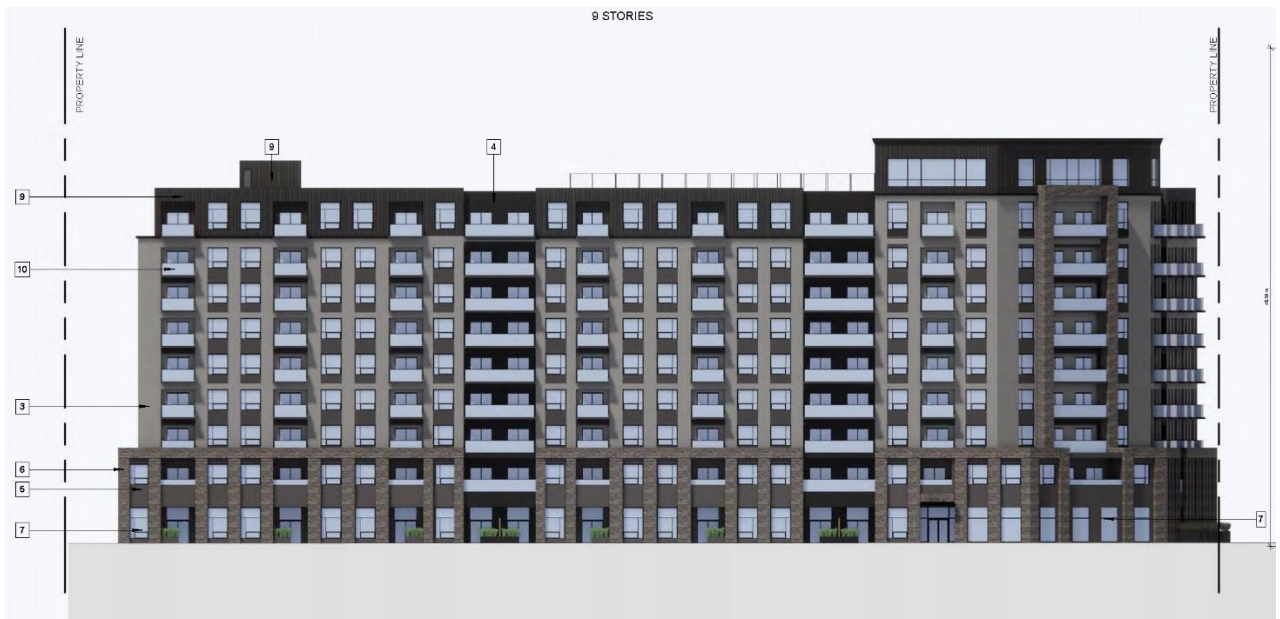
South Elevation (30 Villagewalk Boulevard) (September 2023)
